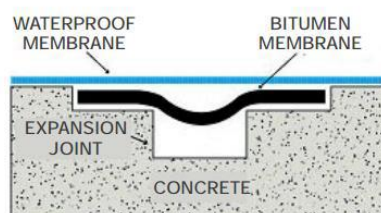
Example of fixing bitumen membrane over building's expansion and movement joint
